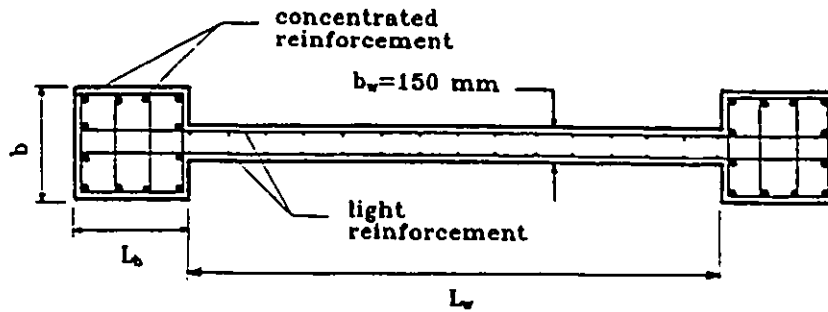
Schematic diagram for a wall cross-section (not to scale)
